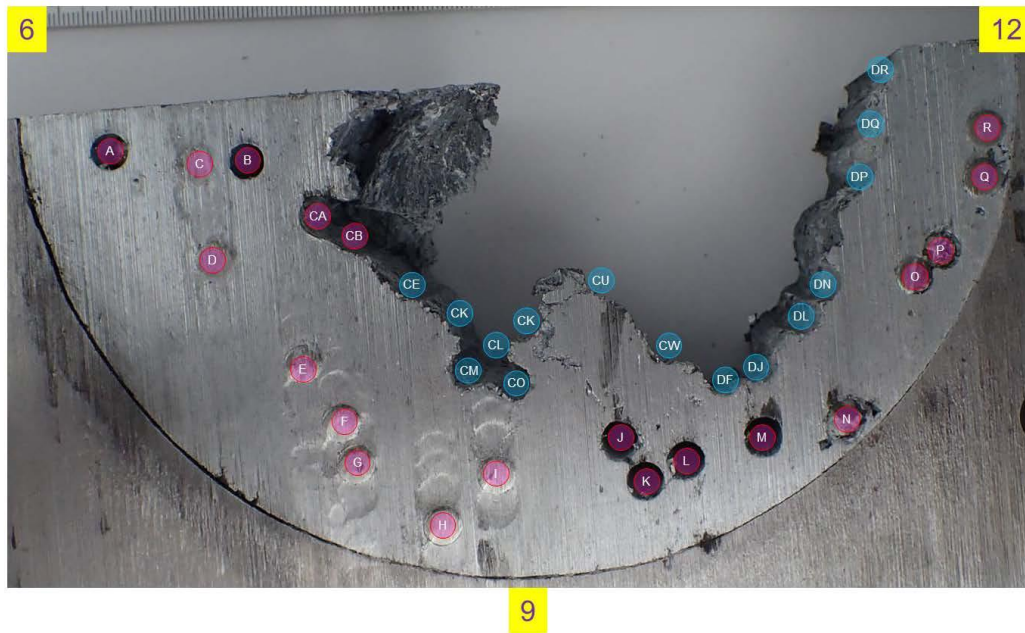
Wire map of the casting cap side of slice 9c. Pink wire labels are wires that fractured within the socket and blue wire labels are wires that remained intact.
